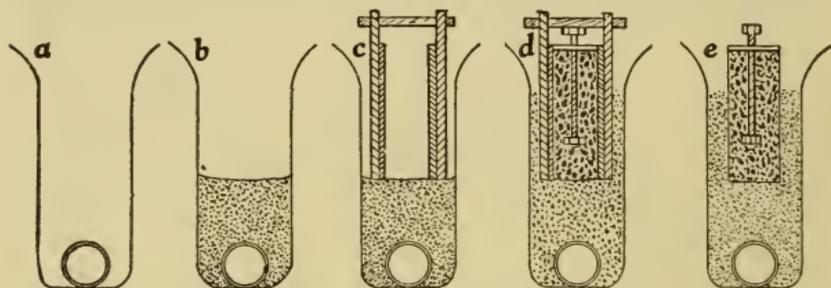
Five steps in the construction of a concrete foundation. *a*, Tile in the bottom of trench; *b*, tamped cinders over drain tile; *c*, forms ready for pouring concrete; *d*, forms filled with concrete, sill bolt in place; *e*, forms removed, foundation completed, and cinders filled in on both sides.
